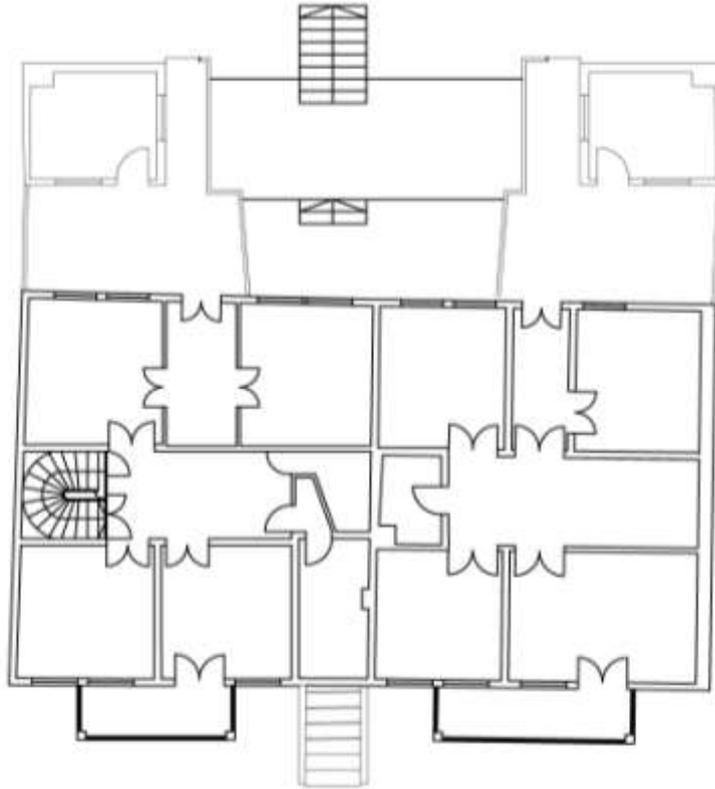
First floor plan of the house at 154 lot 24 parcel
